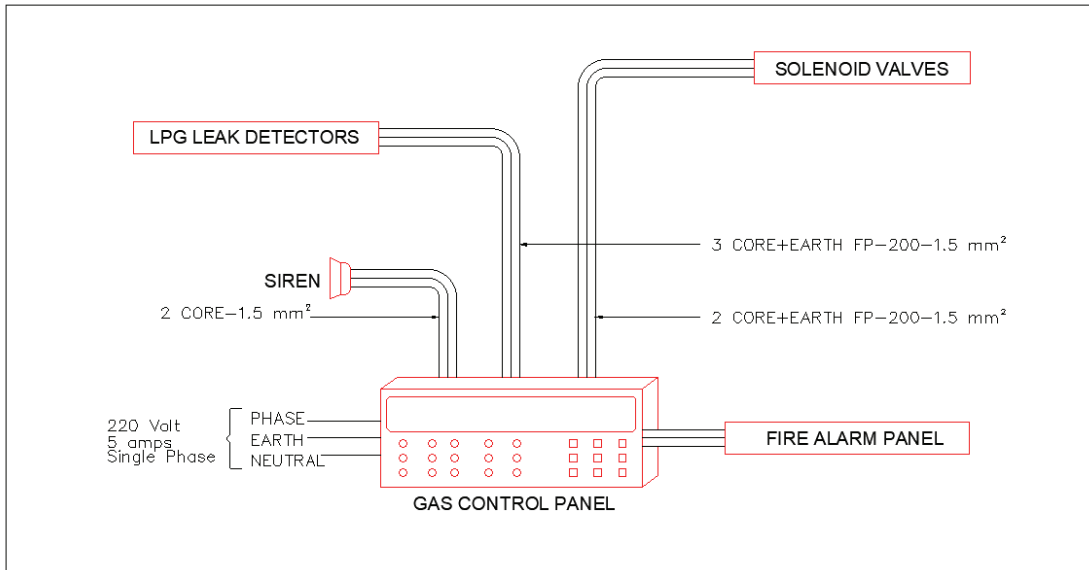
c. Control Panel Wiring Detail for Central Gas System.
